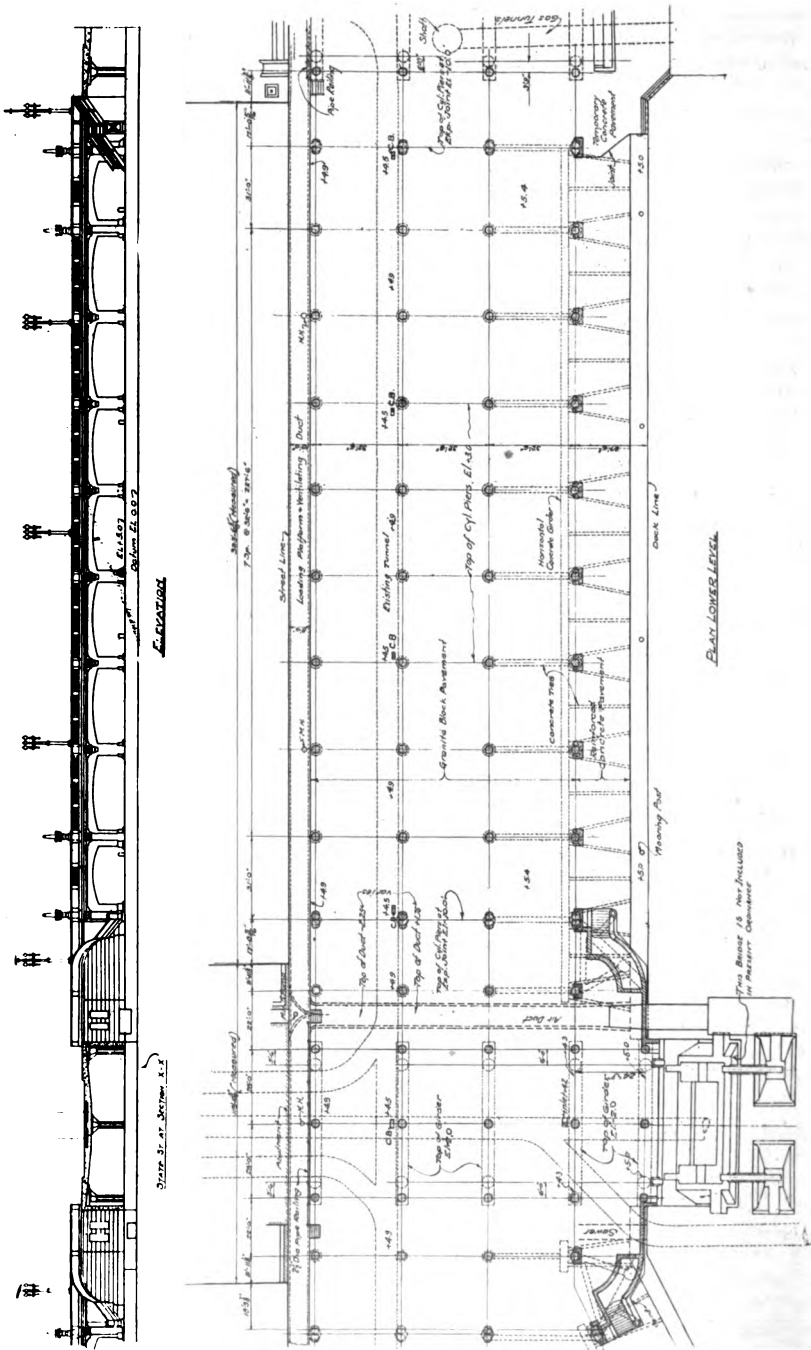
ELEVATION AND PLAN OF LOWER LEVEL—DEARBORN STREET TO STATE STREET.
